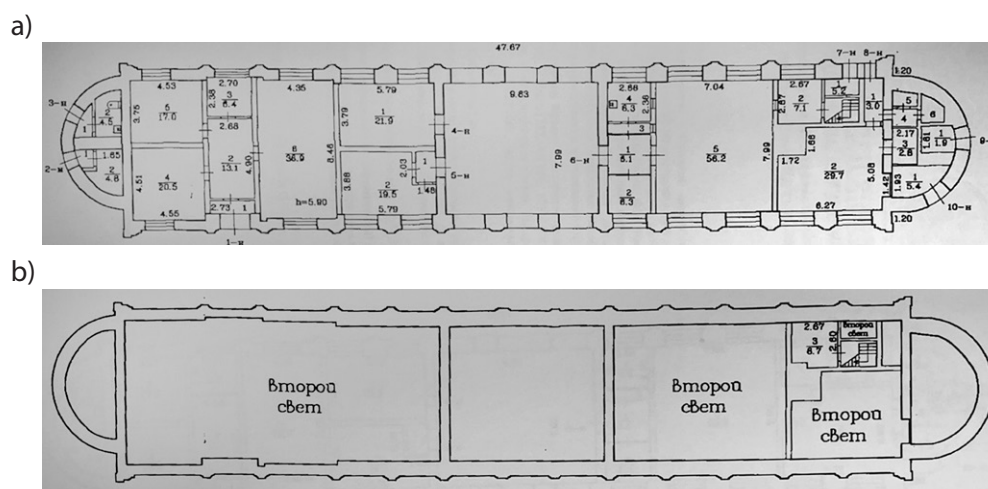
Plan of the Alexandrovskaya station building (technical passport): a) first floor; b) entresol
